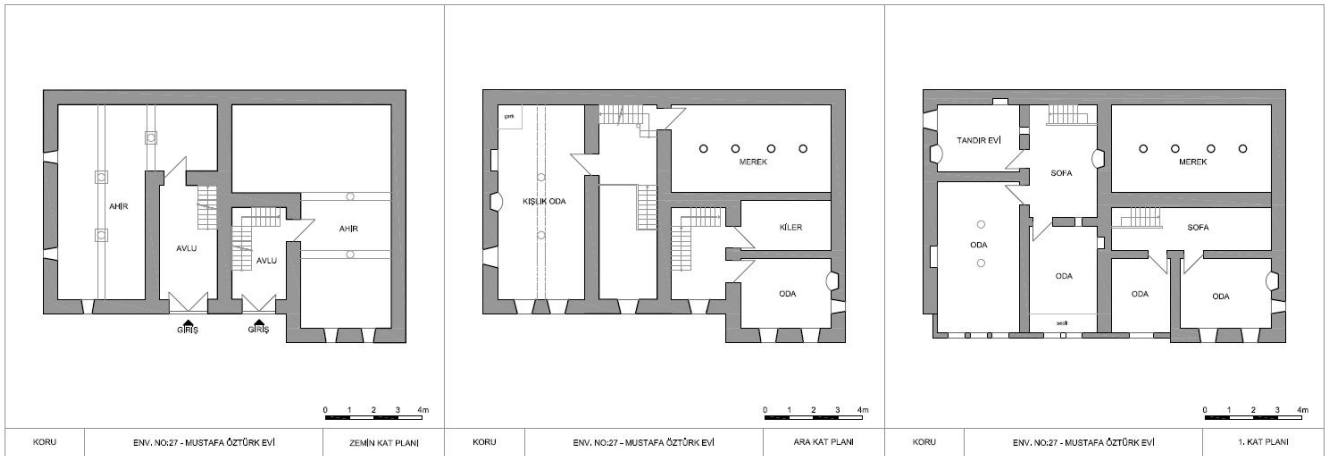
Mustafa Öztürk House Plan Scheme (Example of a two-story “merek”).
